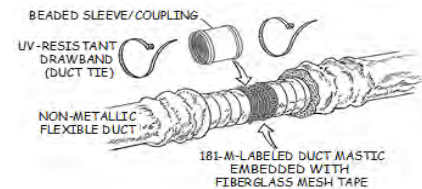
BEADED FITTINGS WITH MASTIC SEALING
